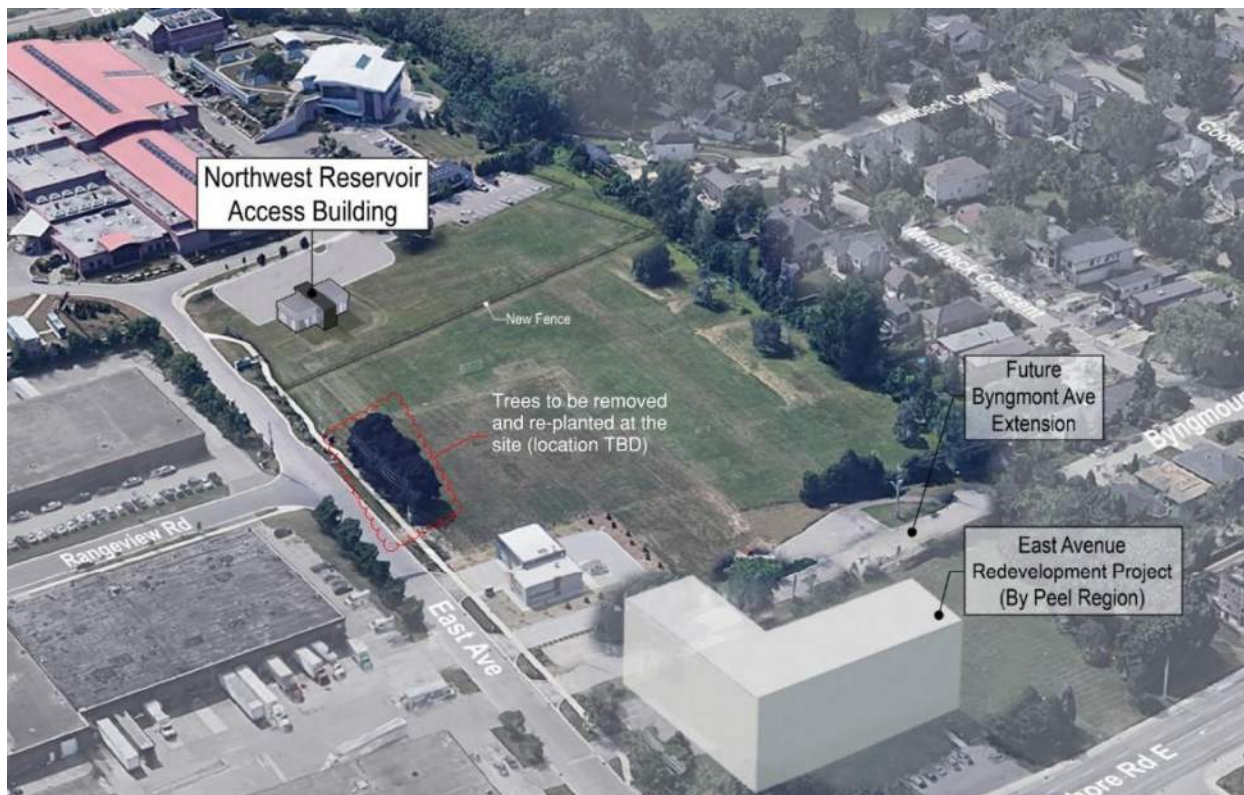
Proposed site plan for the Northwest Reservoir, provided by Hatch.
